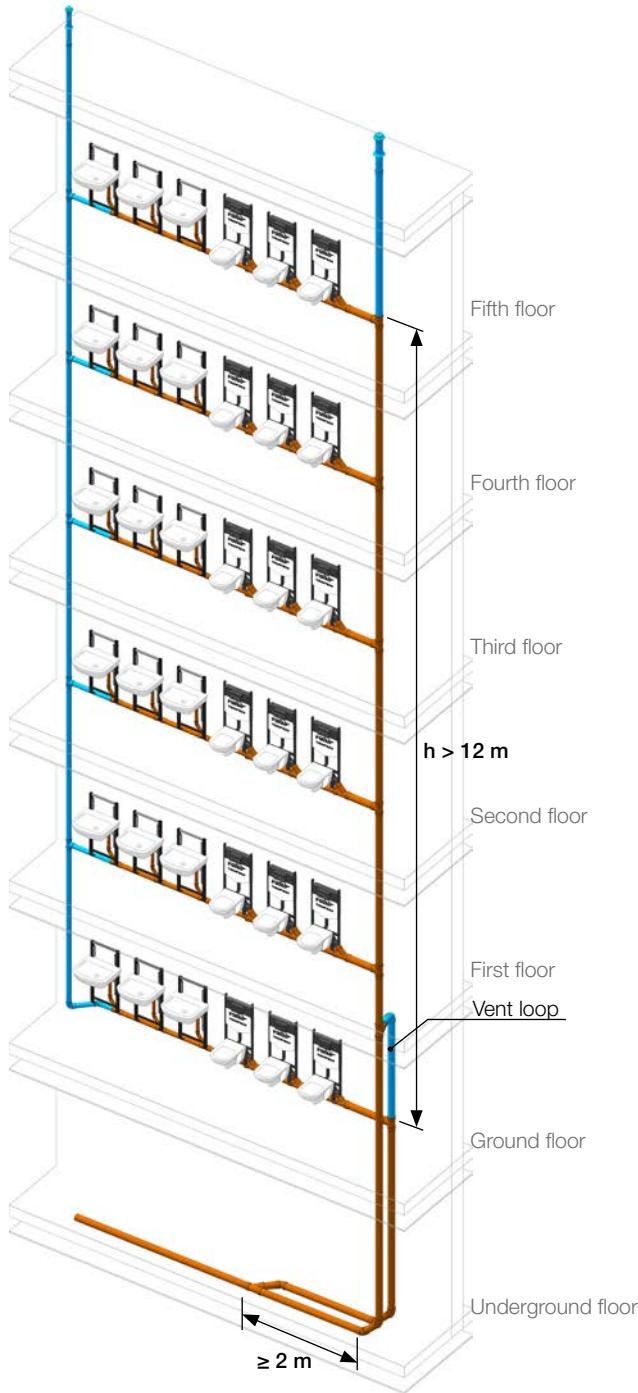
Indirect parallel vent, building with over 5 floors ($h > 12$).
